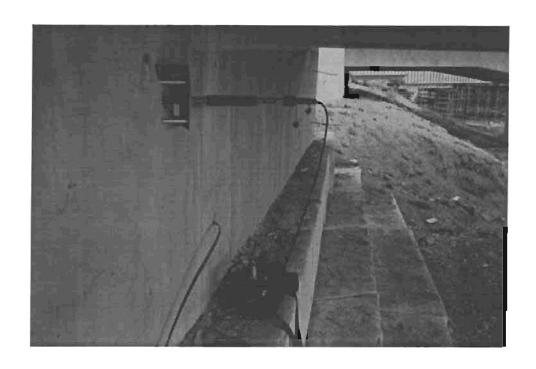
An Extensometer Electrical Sensor Head Installed at an Abutment Wall
